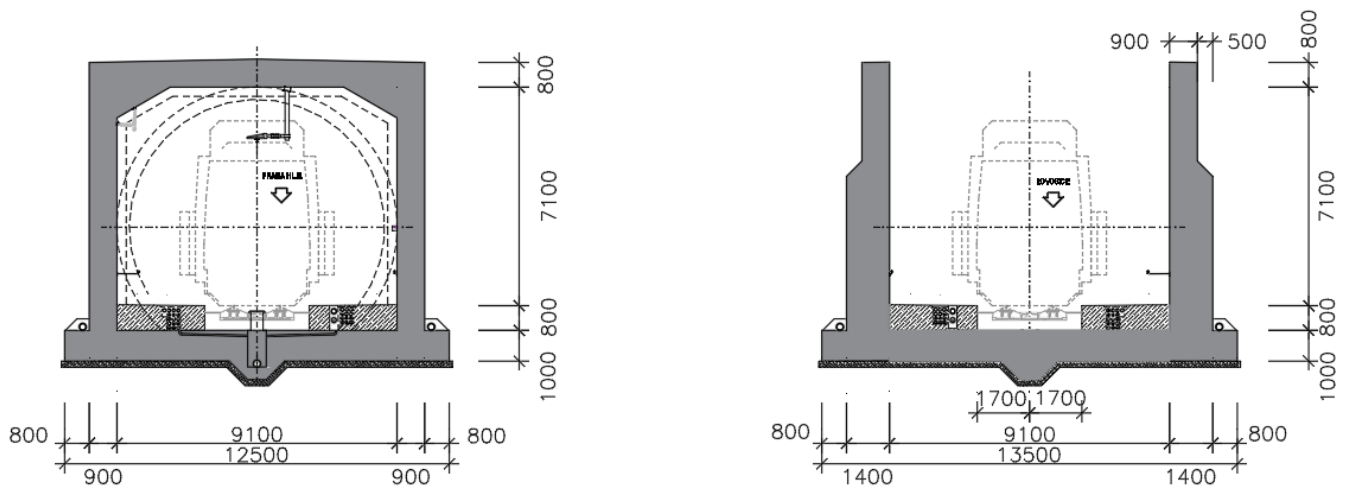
Cross-section of the excavated part of the Strážkov Tunnel
